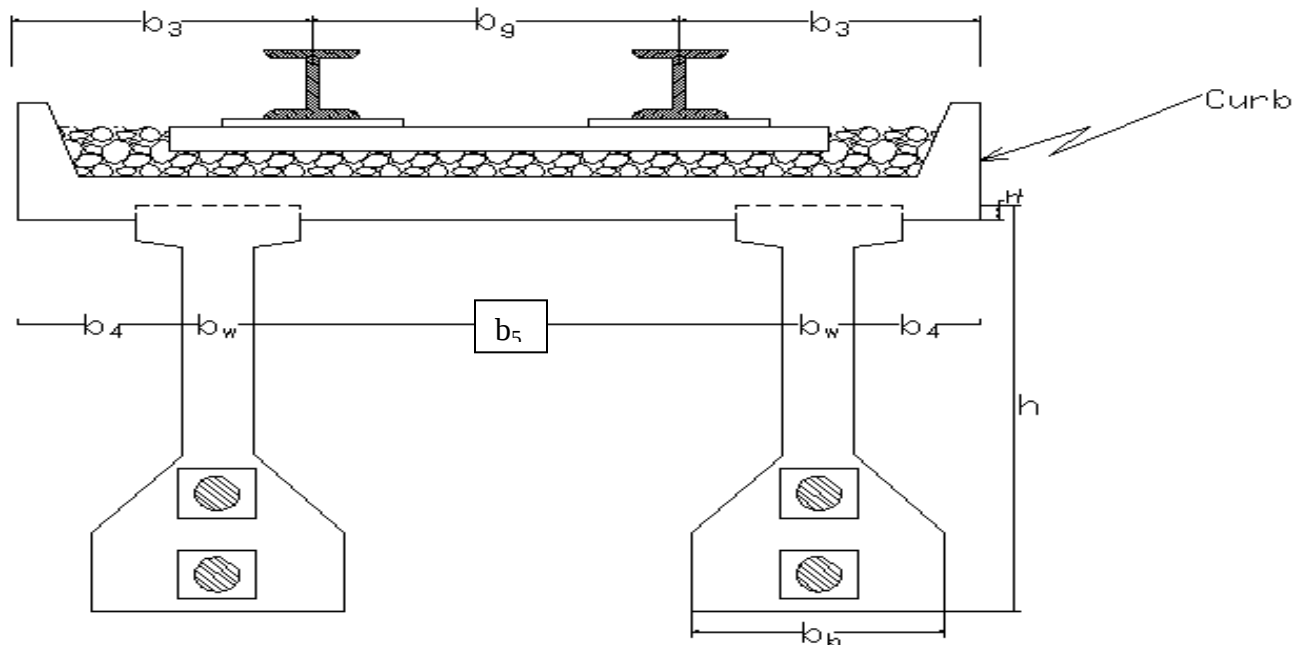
Cross section of a Prestressed Concrete Girder Railway Bridge.
